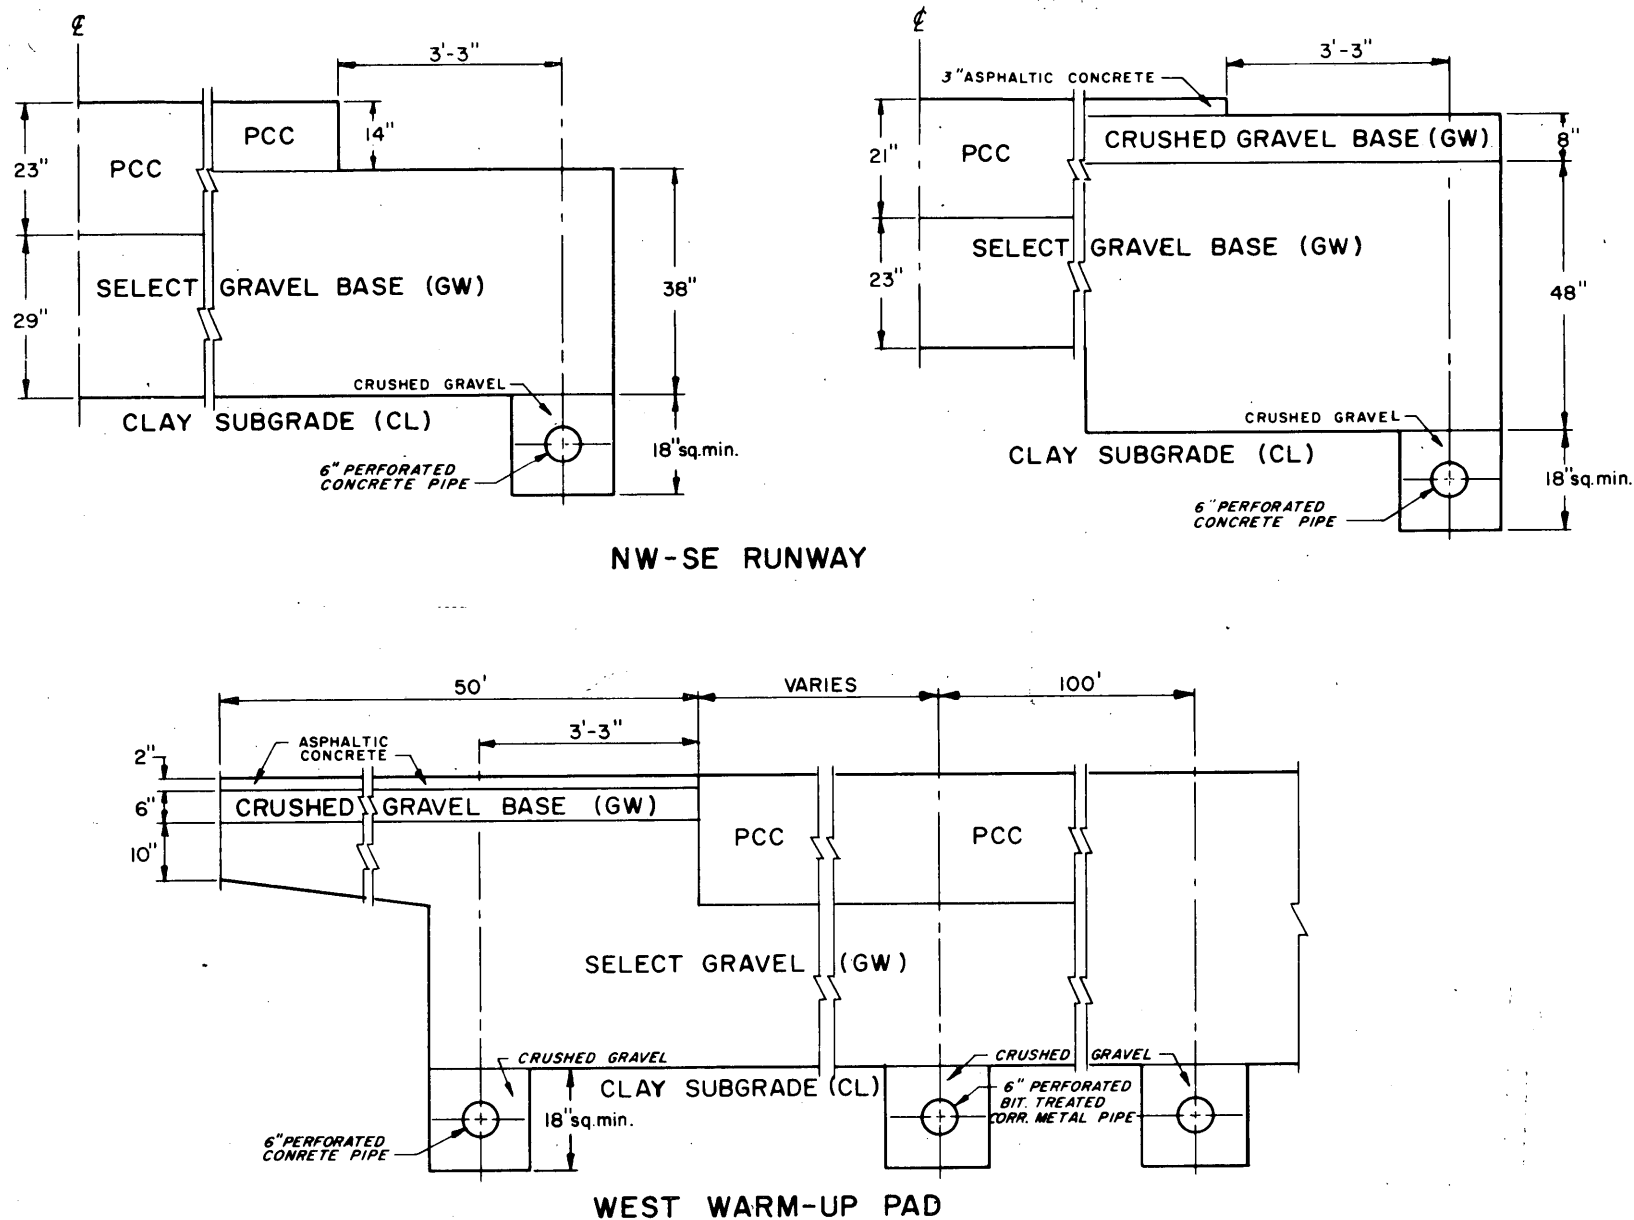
Typical pavement and subsurface drainage sections, Glasgow AFB.
